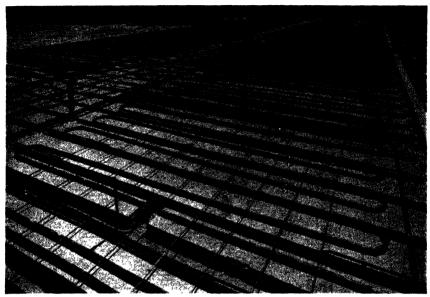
Hospital-floor construction. (A. M. Byers Company.)
